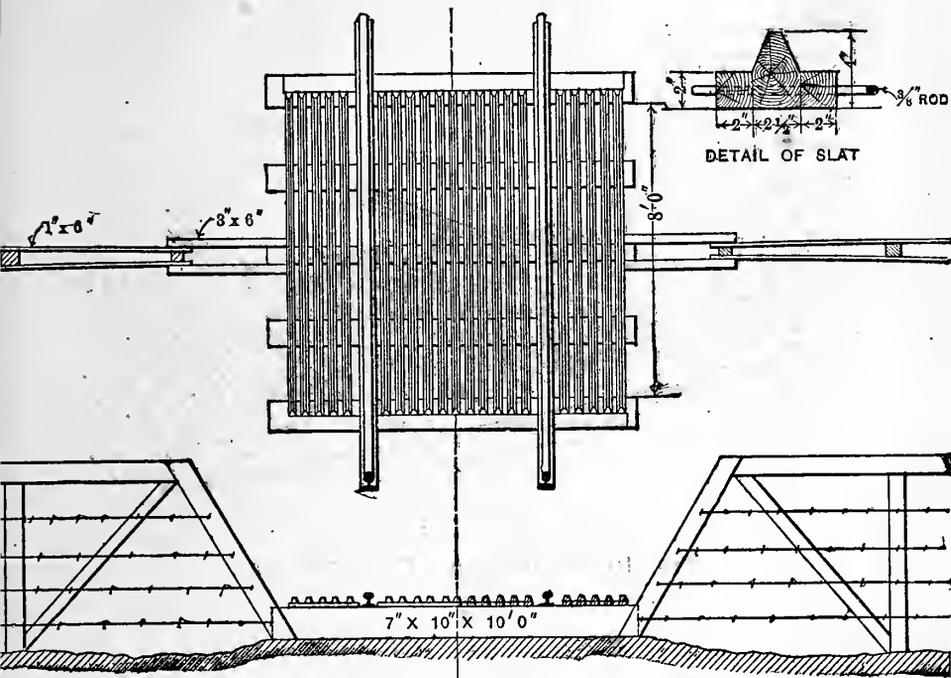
CATTLE-GUARD WITH WOODEN SLATS.
